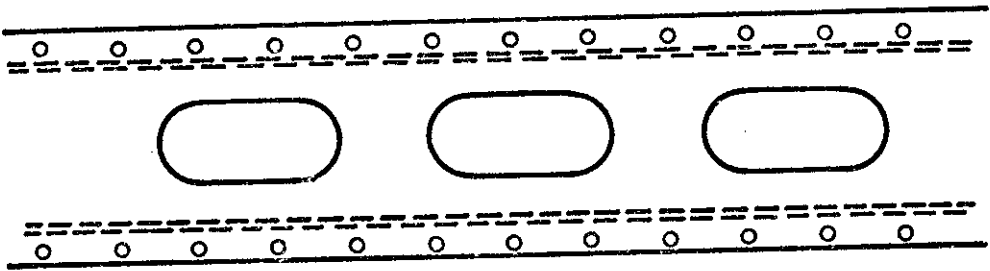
TYPICAL BUILT-UP SECTIONS
